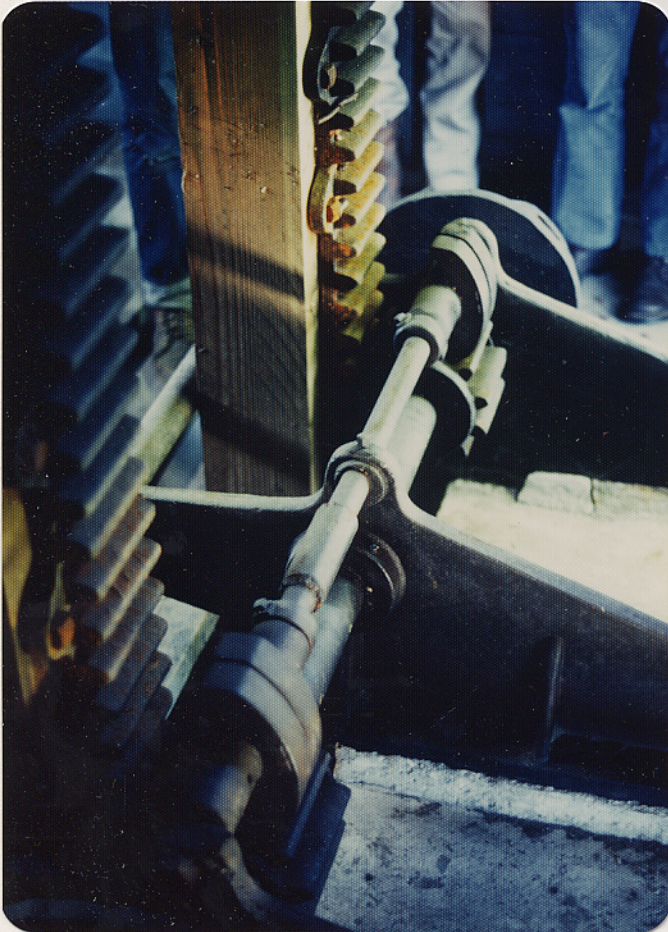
View of the double stem timber sluice gate lifting mechanism.
